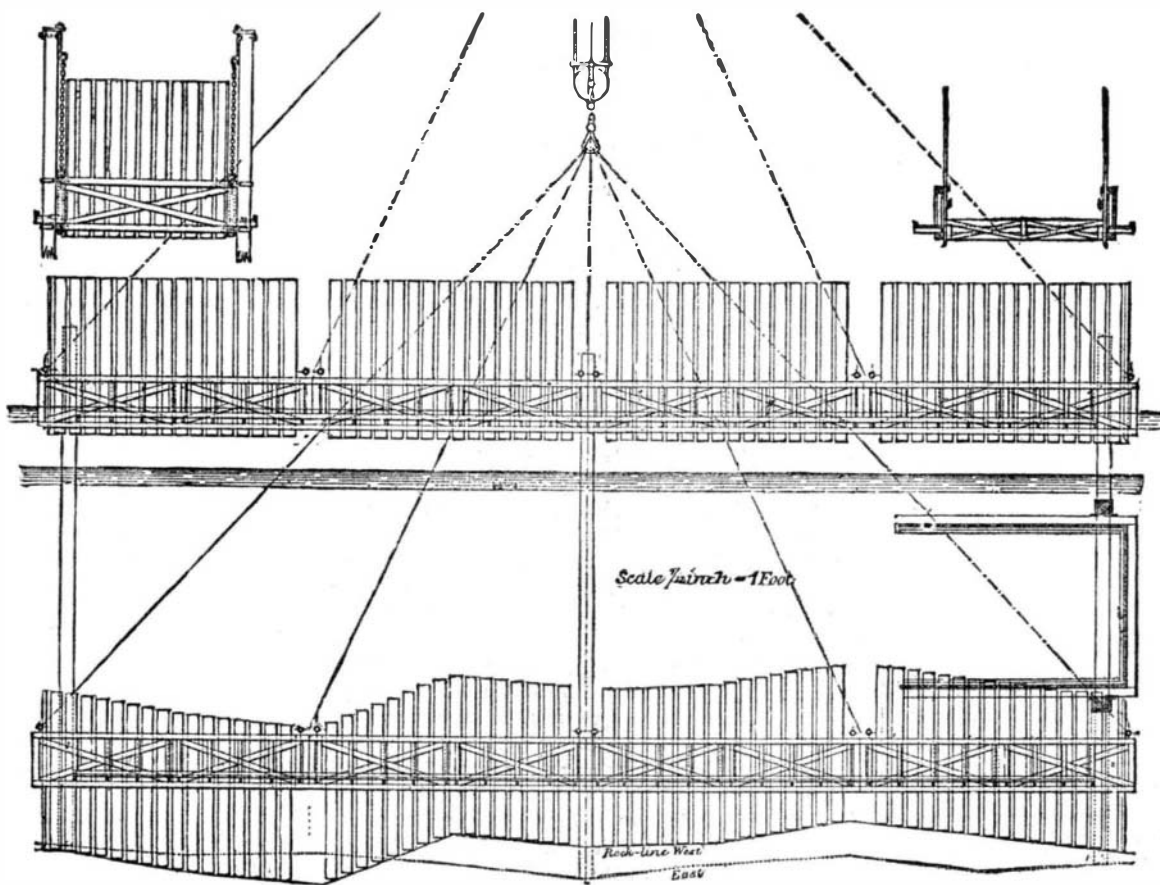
CONSTRUCTING THE FOUNDATIONS.
